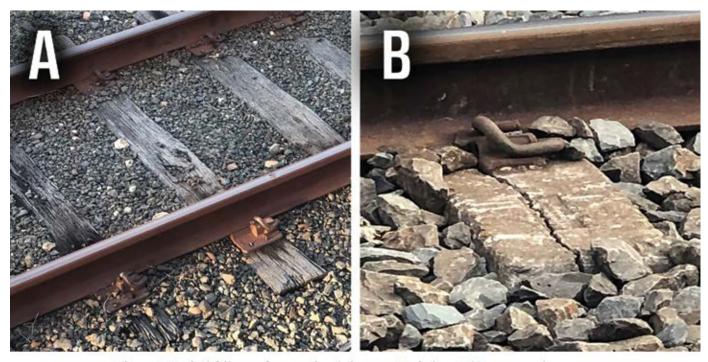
Typical failures of conventional sleeper - (a) timber & (b) prestressed concrete
